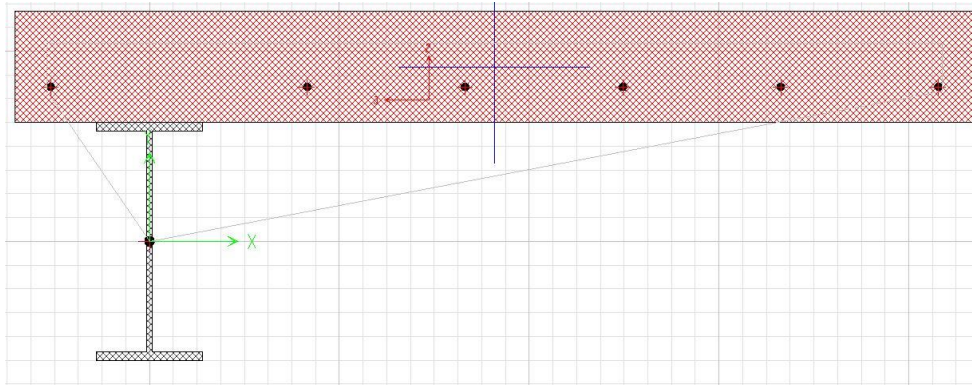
Composite beam with effective width of reinforced concrete slab
